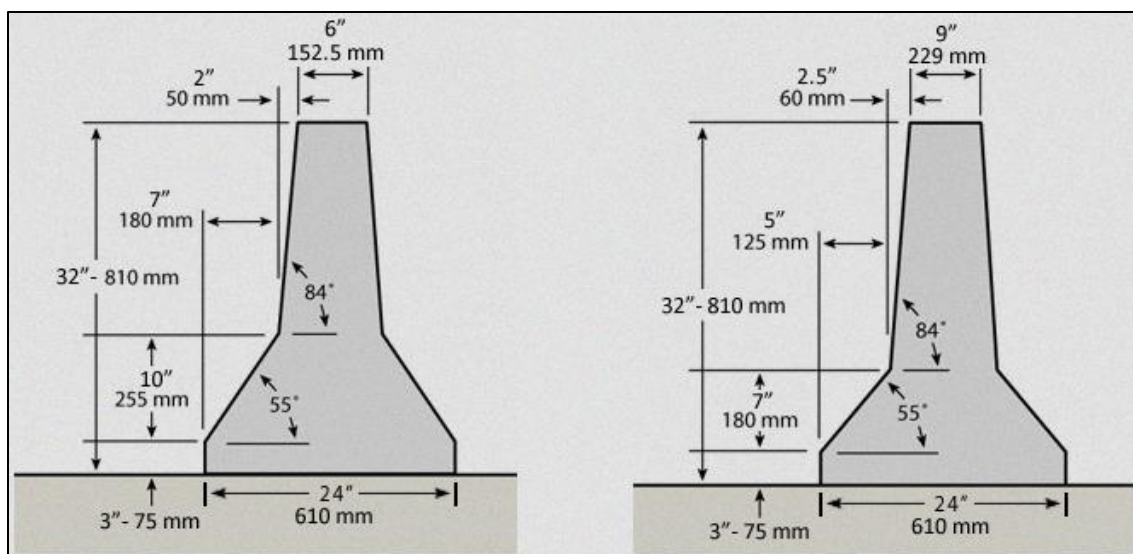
New Jersey Shape (left) and F-shape (right) Barriers Developed by J-J Hooks
